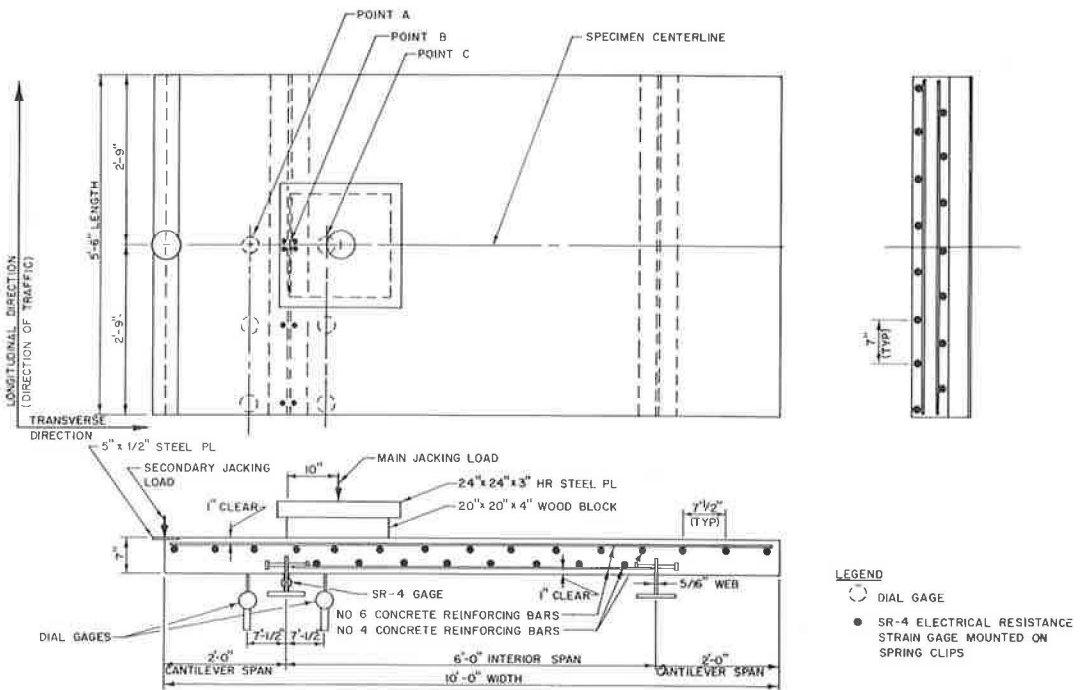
Testing arrangement for experimental T-cast units and details of their construction.
